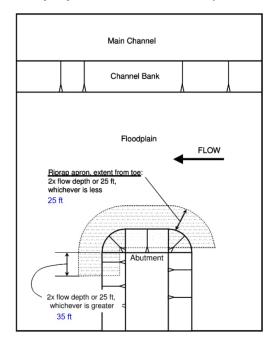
Scour Countermeasures at Bridge Abutment (HEC-23 Manual)
